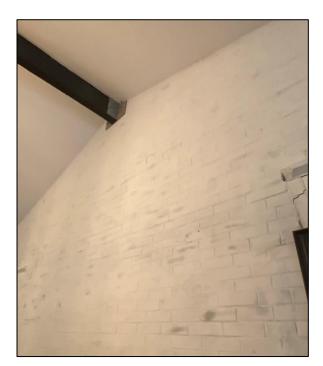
Wooden beam covering the former flagpole opening (Town of Halton Hills 2024)
